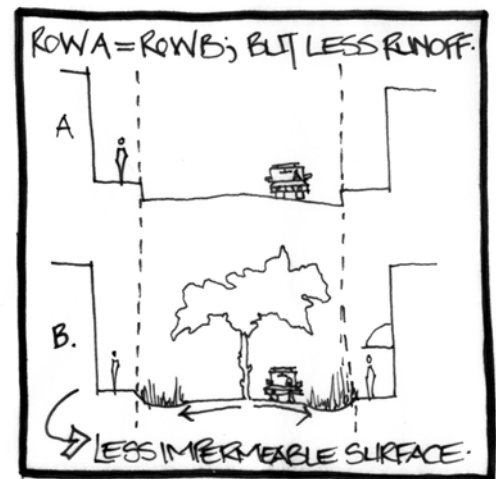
Adding planting strips and swales to streets reduces and cleans runoff.
